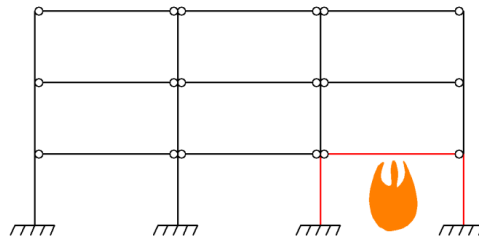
The adopted calculated fire scenario for a frame with hinged beam-to-column connections
